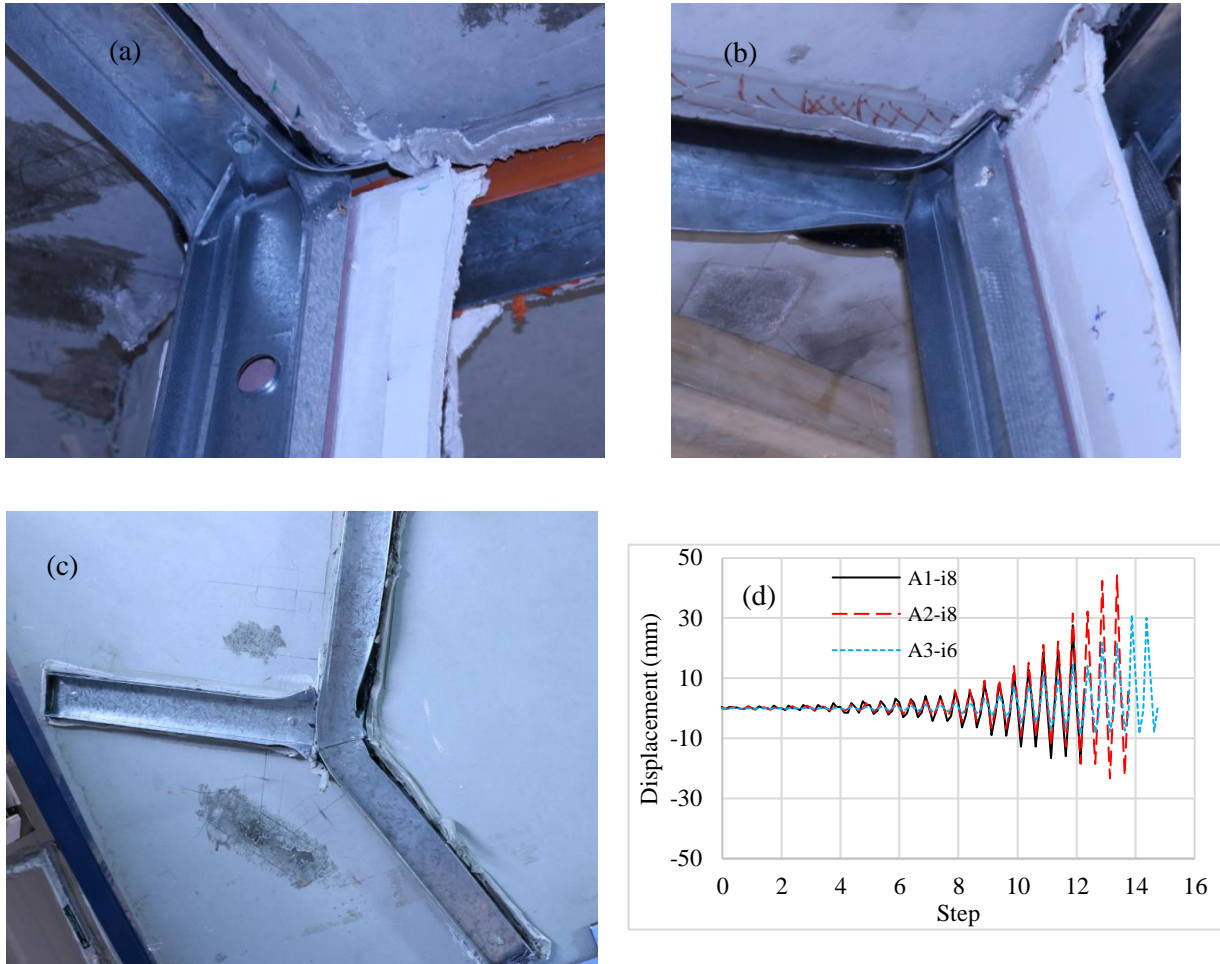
Damage to steel tracks at Y-junction for specimen (a) A1 (b) A2, and (c) A3. In particular showing bent flanges of 90° angled wall top track. (d) Shows the out-of-plane relative movement between 90° return wall at location 19 top corner and top slab for the three specimens (*data missing for specimen A1 due to instrumentation failure).
